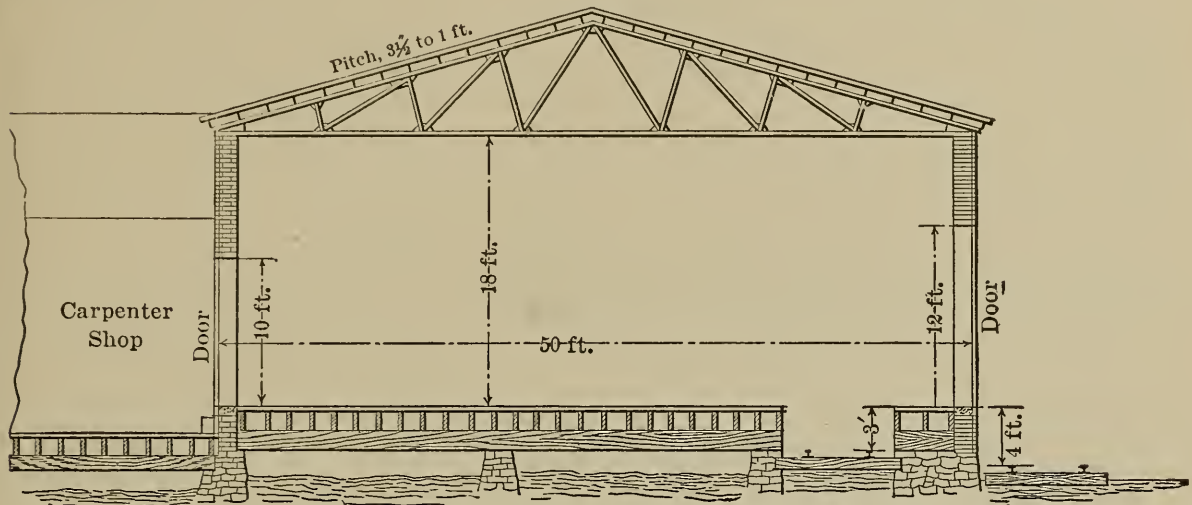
Cross Section through Storehouse, Carpenter Shop, Tracks, etc.
